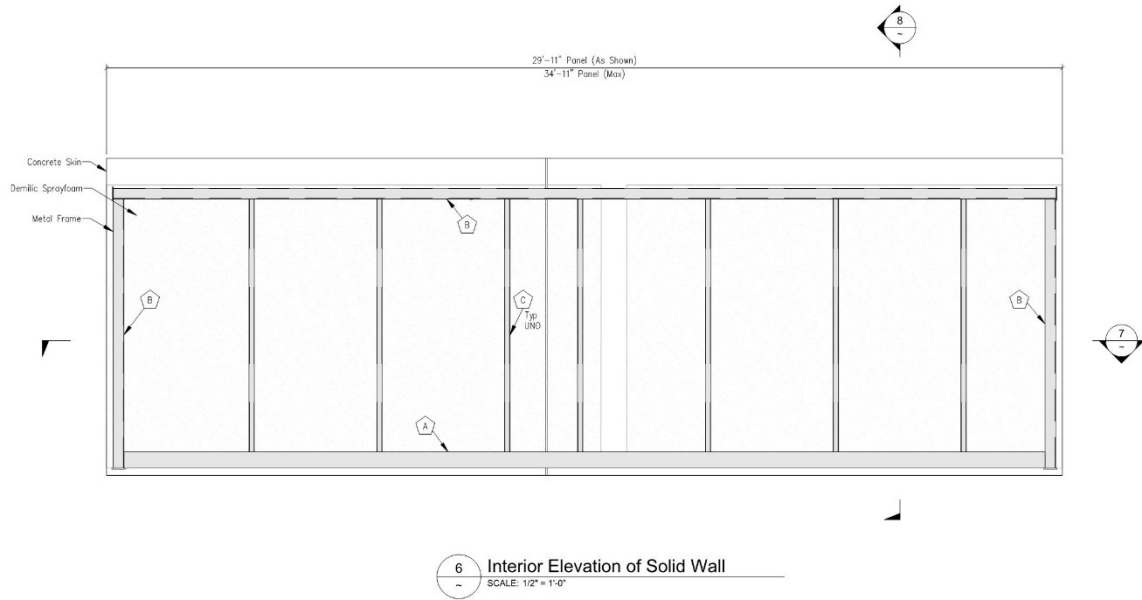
Infinite Facade solid wall panel interior elevation (not to scale)
